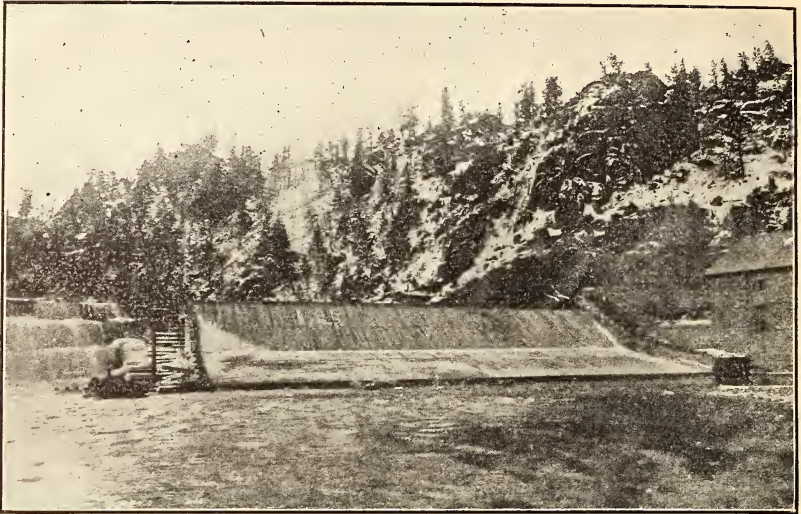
Canyon Ferry Dam, showing the reconstructed portion as well as part of the old dam.
